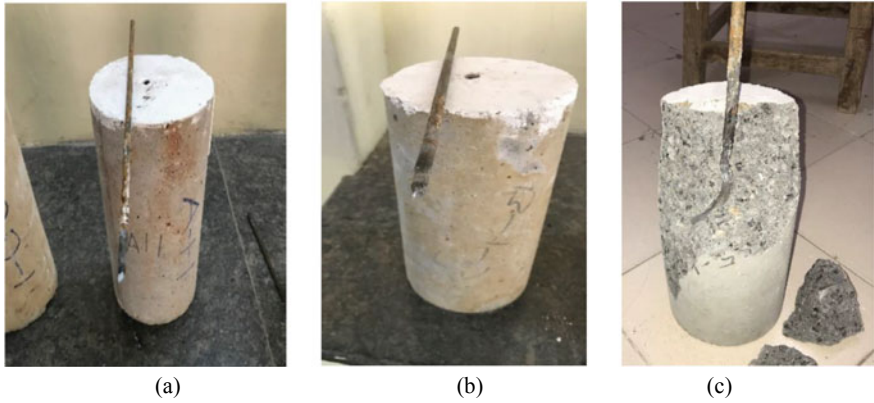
Specimen failure pattern of a 6 mm b 8 mm and c 10 mm diameter rebars
